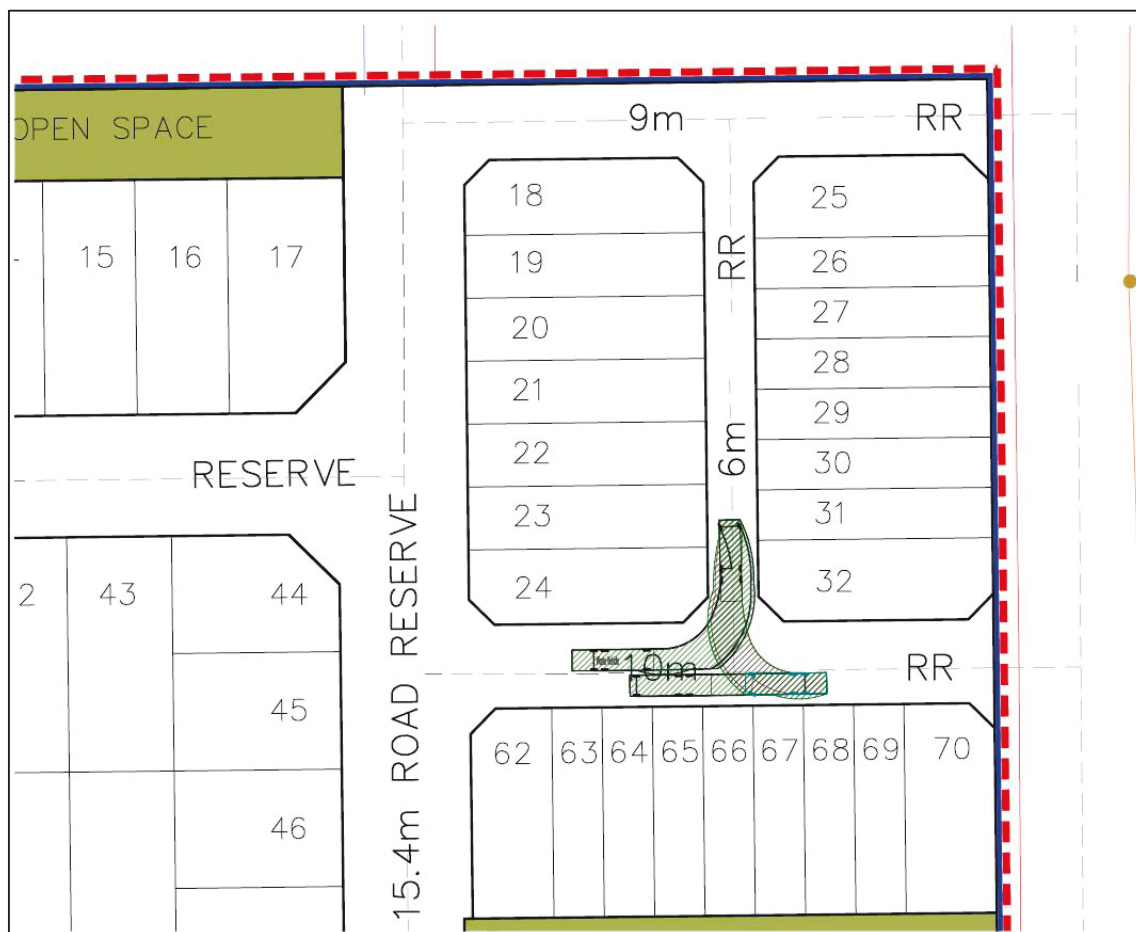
AutoTrack Assessment - 9.7m Waste Vehicle - Reversing from Laneway Towards Access Road
